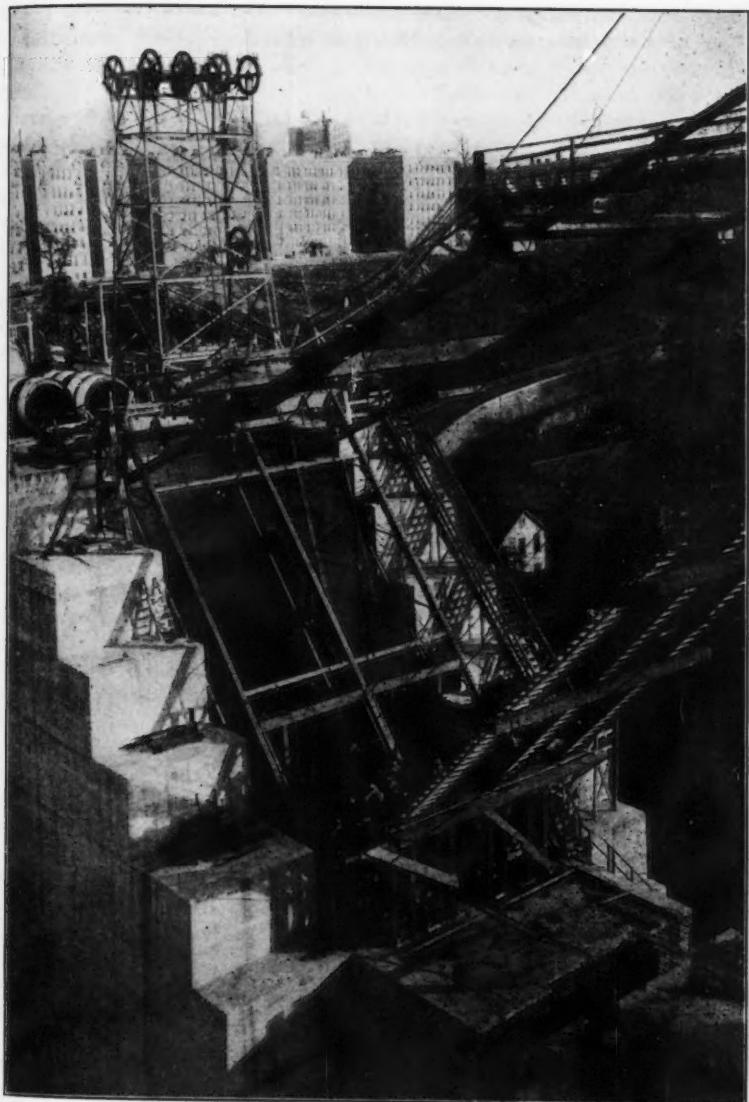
SPINNING EQUIPMENT, NEW YORK ANCHORAGE.
